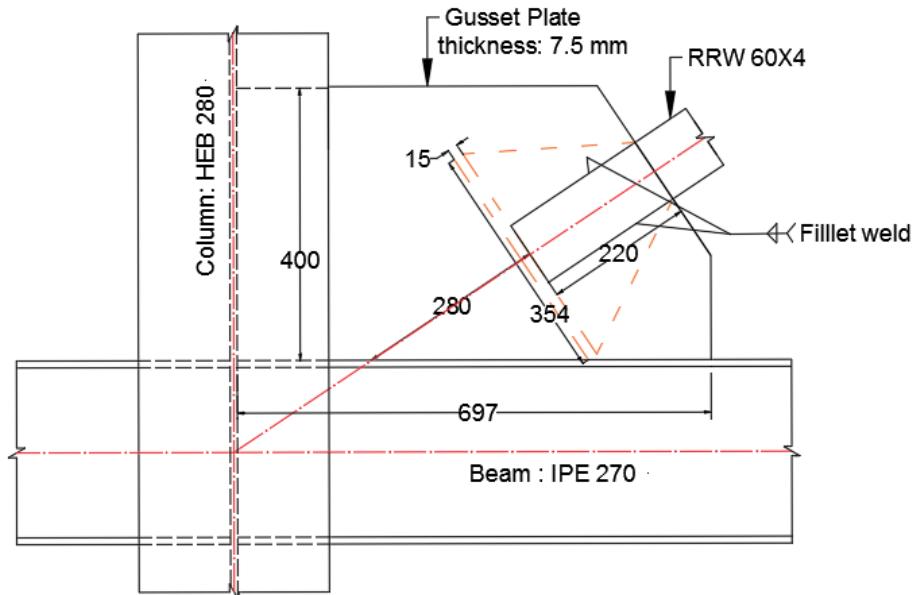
Connection detail for 1st and 2nd storeys (dimensions in mm)
